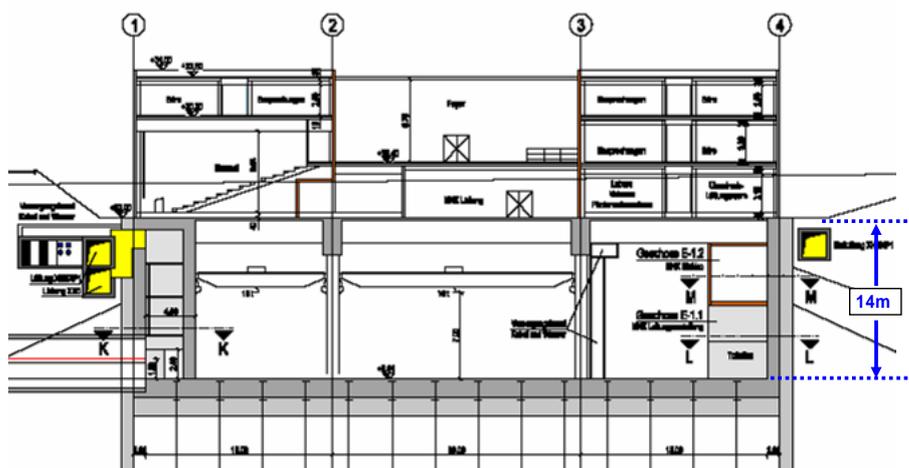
Side view of the experimental hall (photon beam lines are to the left) and of the surface building on top.
